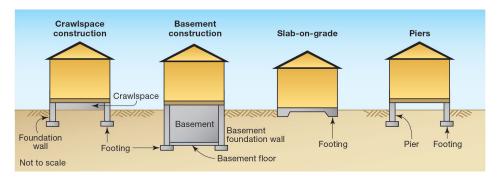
The four foundation types represented in this figure are crawl space construction, basement construction, slab-on-grade and piers.
